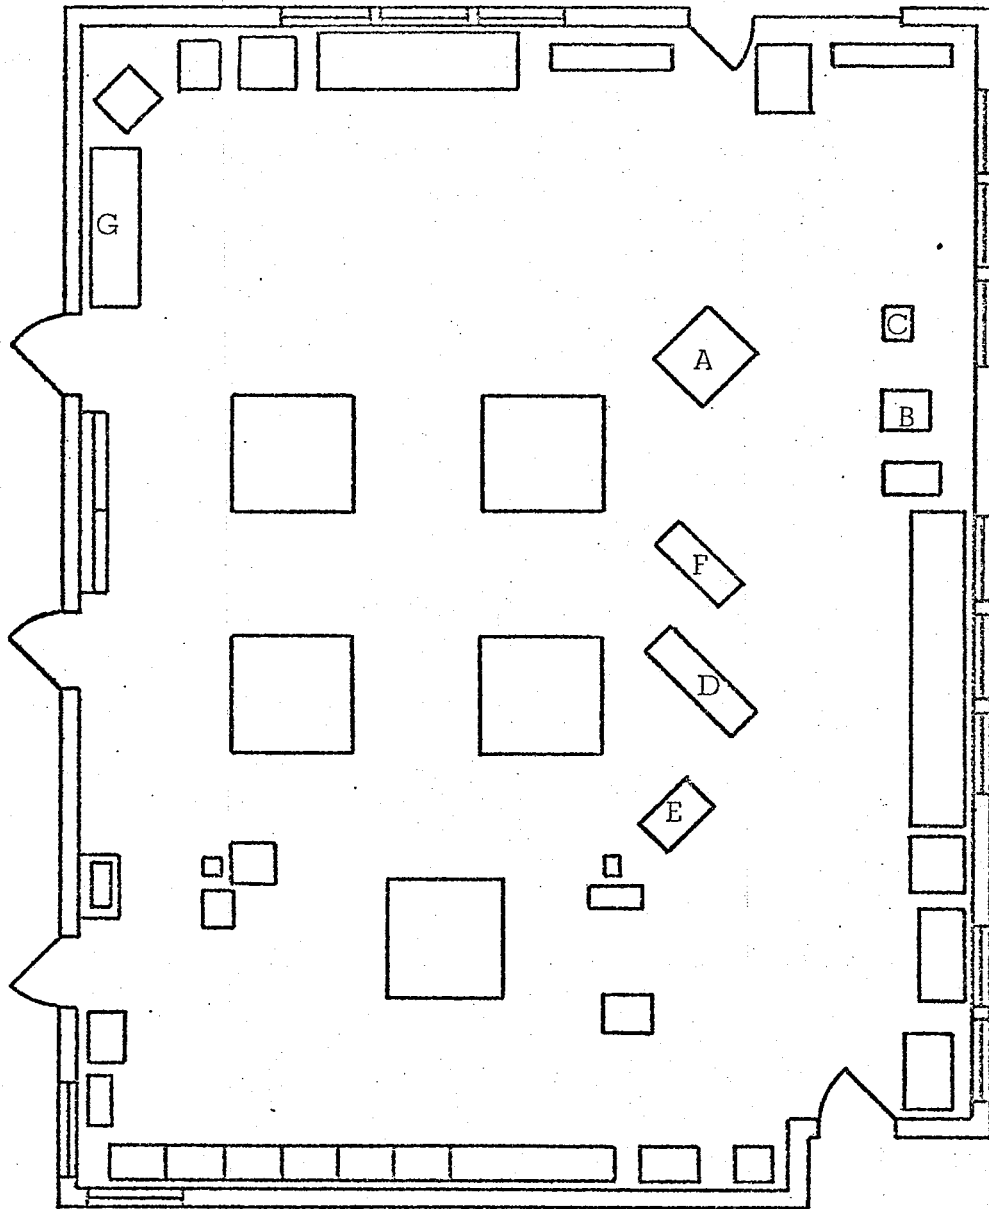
Woodworking Technology Laboratory Floor Plan
